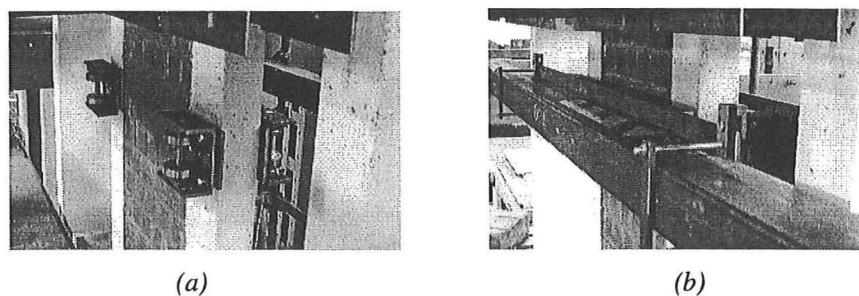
Detail of roller bearings: (a) before and (b) after the exterior frame is in position
